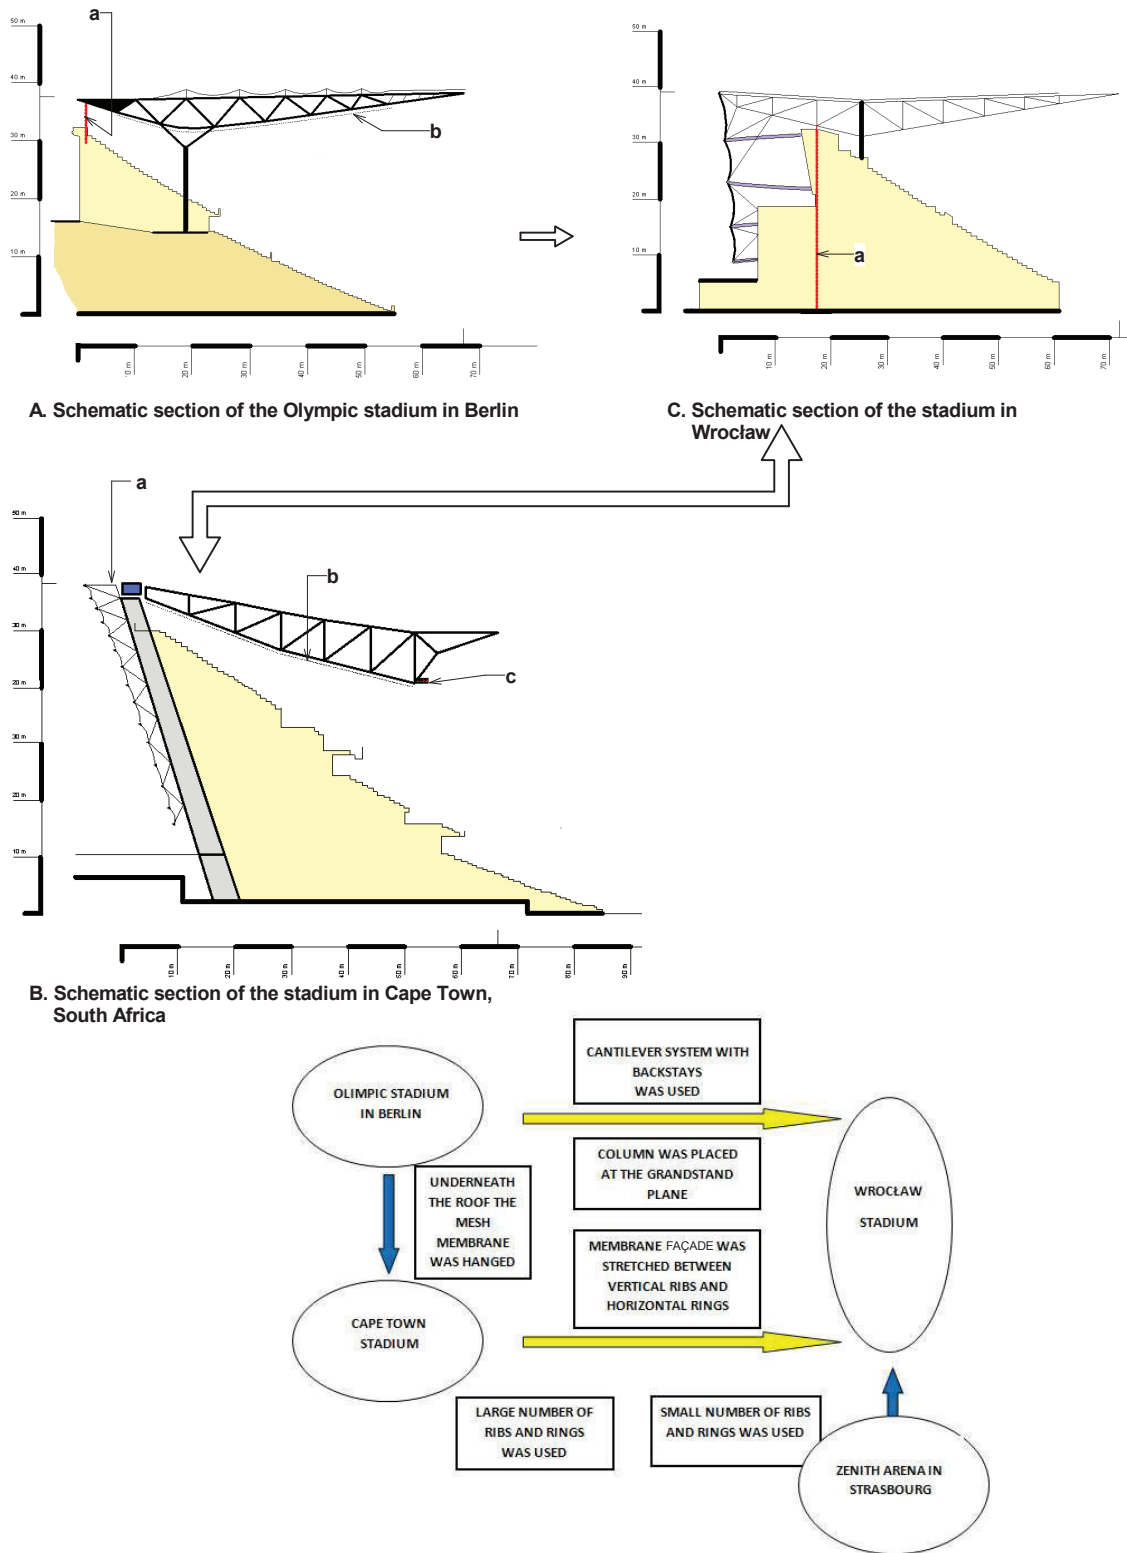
The stadiums in Berlin, Cape Town and Wrocław – differences and similarities. A) Schematic section of the Olympic stadium in Berlin: a – truss girder backstay, b – membrane underneath the roof. B) Schematic section of the stadium in Cape Town, South Africa [1]: a – compression ring, b – membrane underneath the roof, c – tension ring. C) Schematic section of the Wrocław stadium: a – truss girder backstay, D) List of differences and similarities. Developed by: M. Pelczarski
